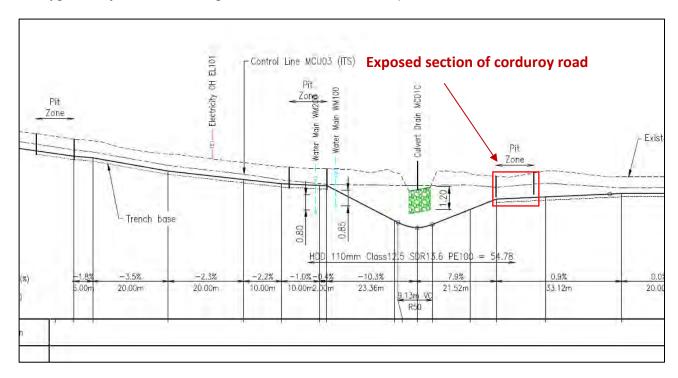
2022 plan showing location of corduroy road (Source: Adapted from TMR/Aurecon, B2N Rail Upgrade Project, Public Utility and Plant Sheet 1 of 7, 18/10/2022).
